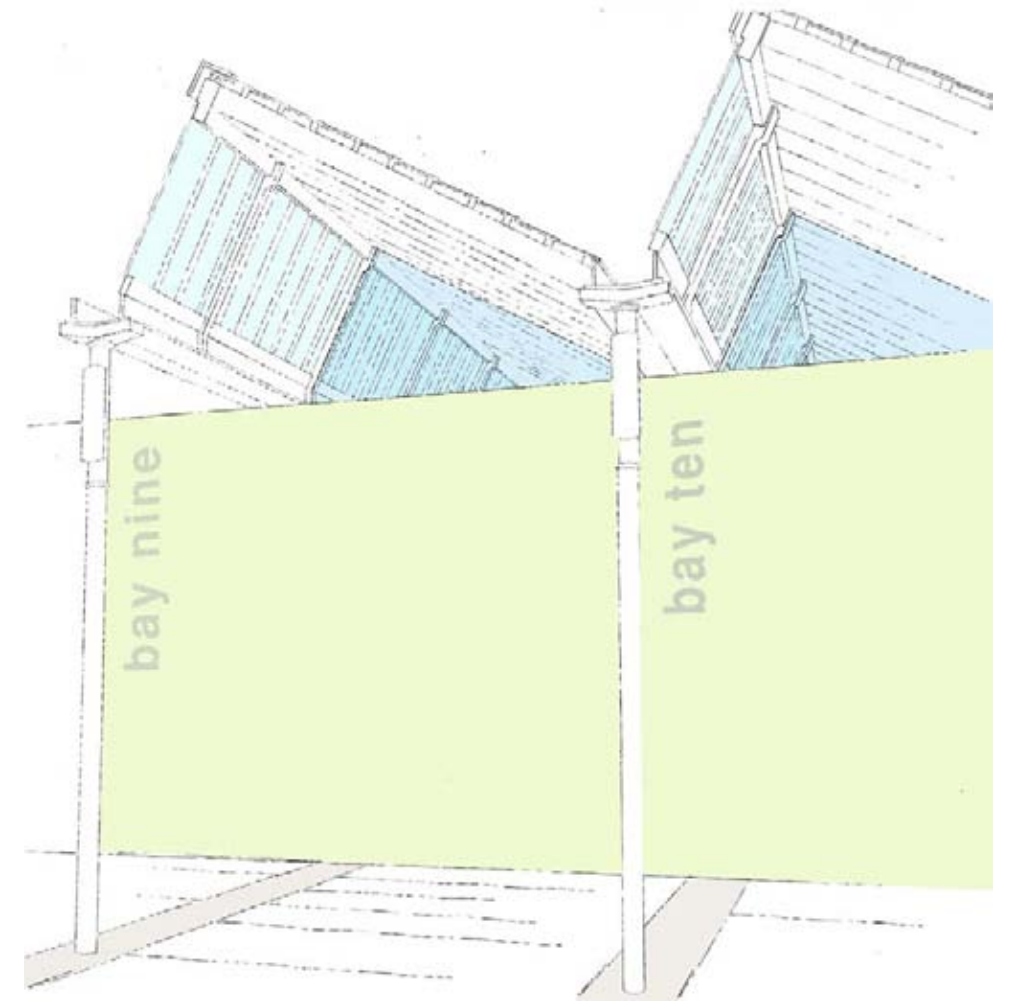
New walls at 90 deg to the gutter beams sealed to the underside of the ridge T-Sections. Potential for glass infill at high level as illustrated
